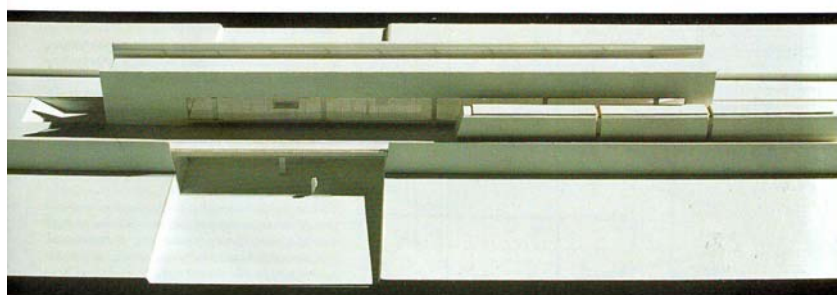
Picture of a model of the proposed overground Metro station (Sørensen and Juul-Sørensen, 1996: 20)
